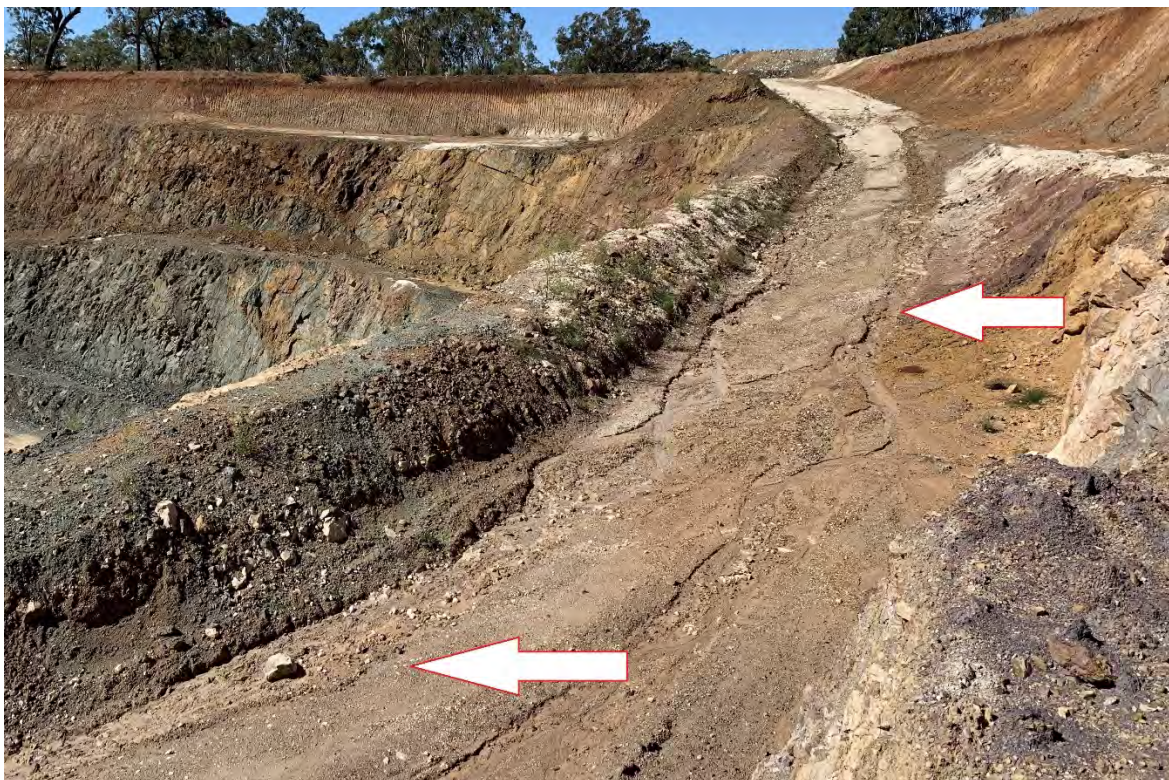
Gully cut by water shedding off the central ramp on the north wall of the East-West pit requires lining and sediment traps.
